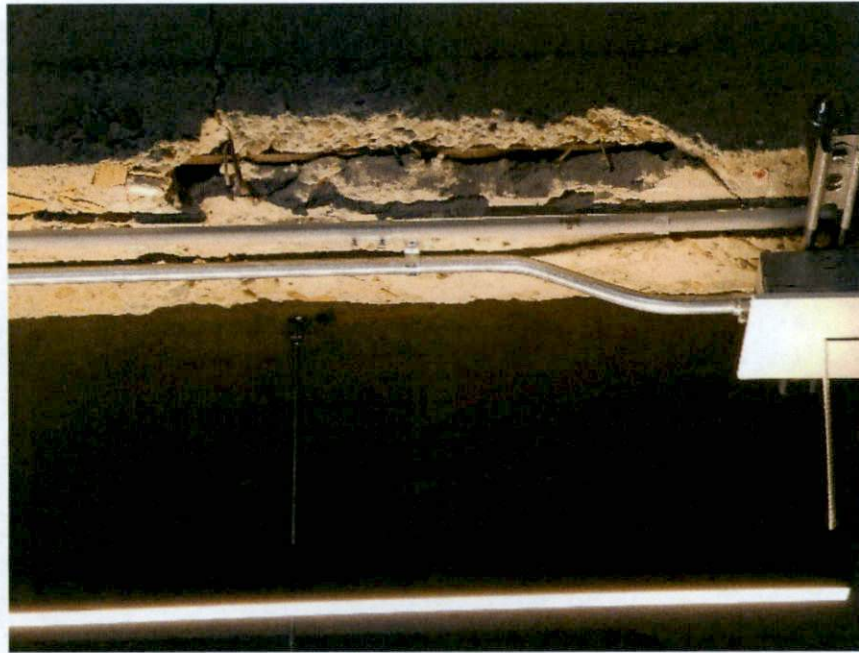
Example of cracked concrete cover over beam and exposed rebar - Eighth Floor.
